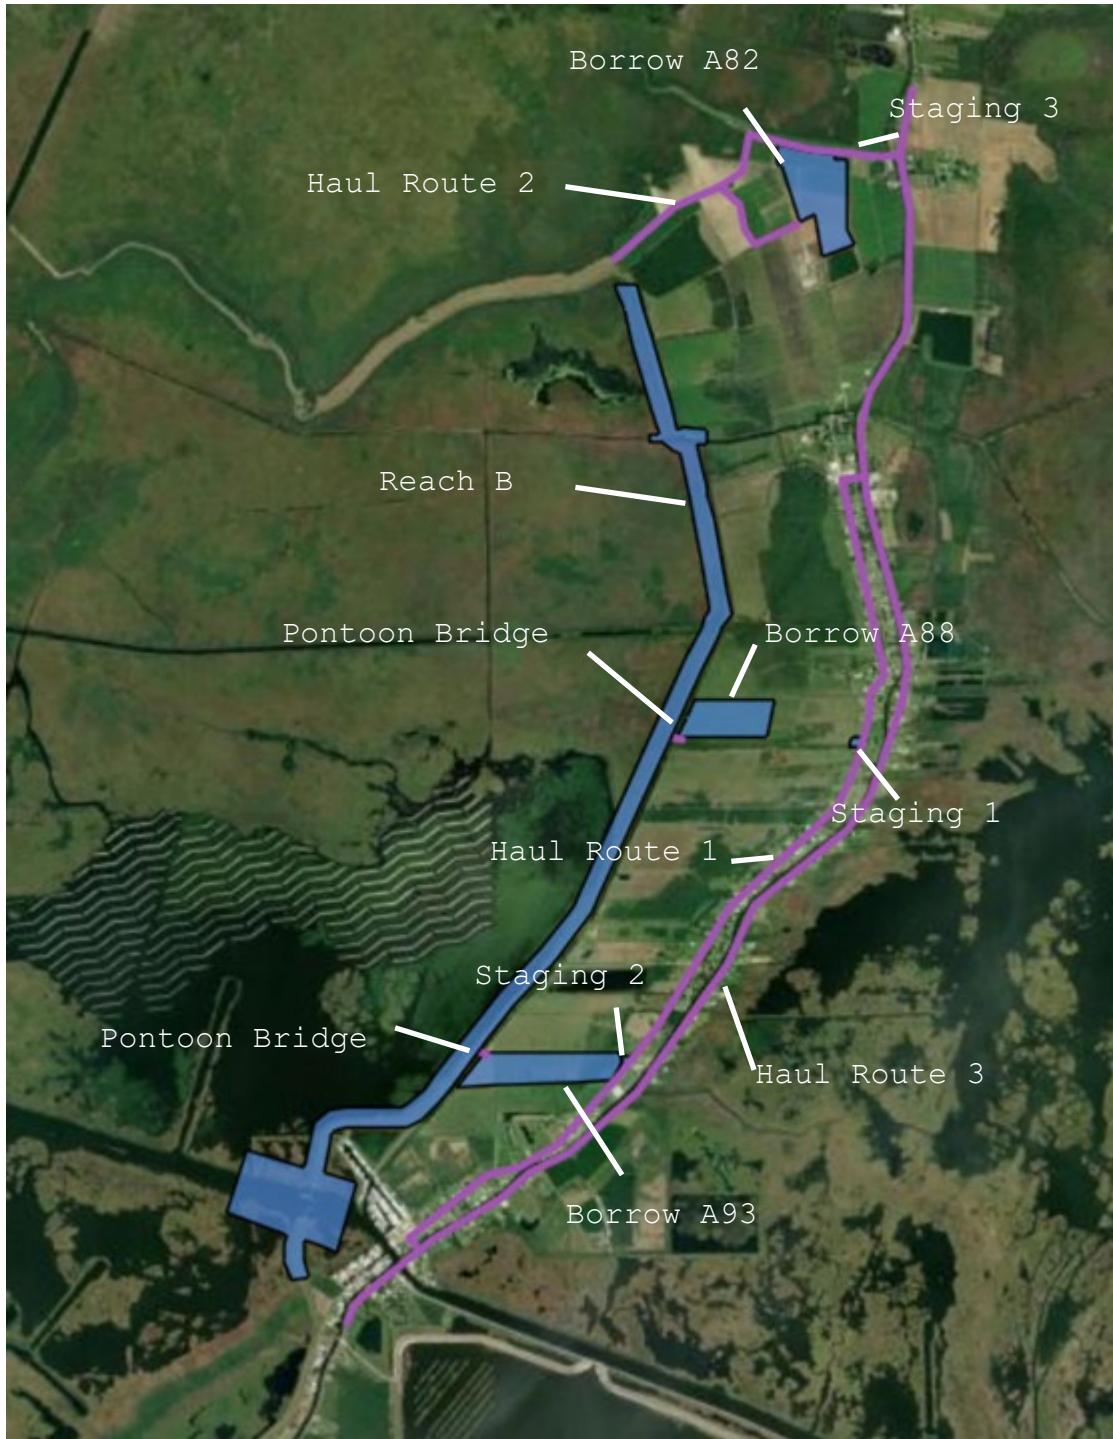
Reach B haul routes, borrow sites, staging areas, and pontoon bridge locations.
